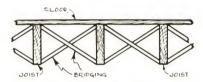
Bridging Between Joists (See Example in Fig. 108)
